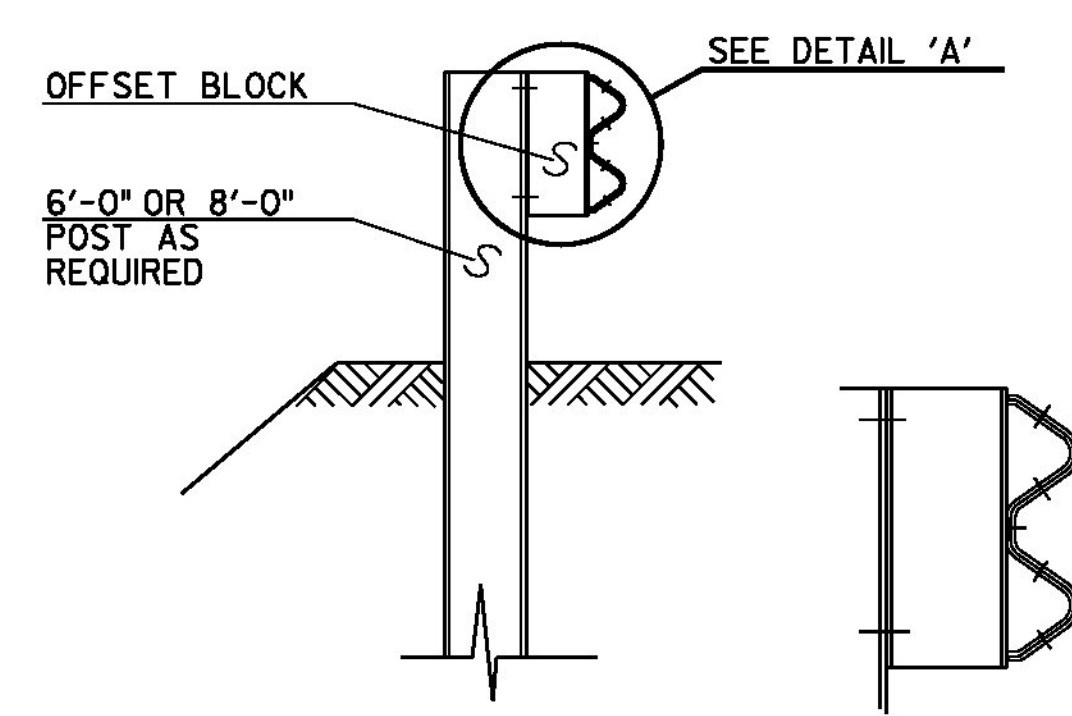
DETAIL OF STEEL BEAM GUARDRAIL AT SMALL CULVERTS
